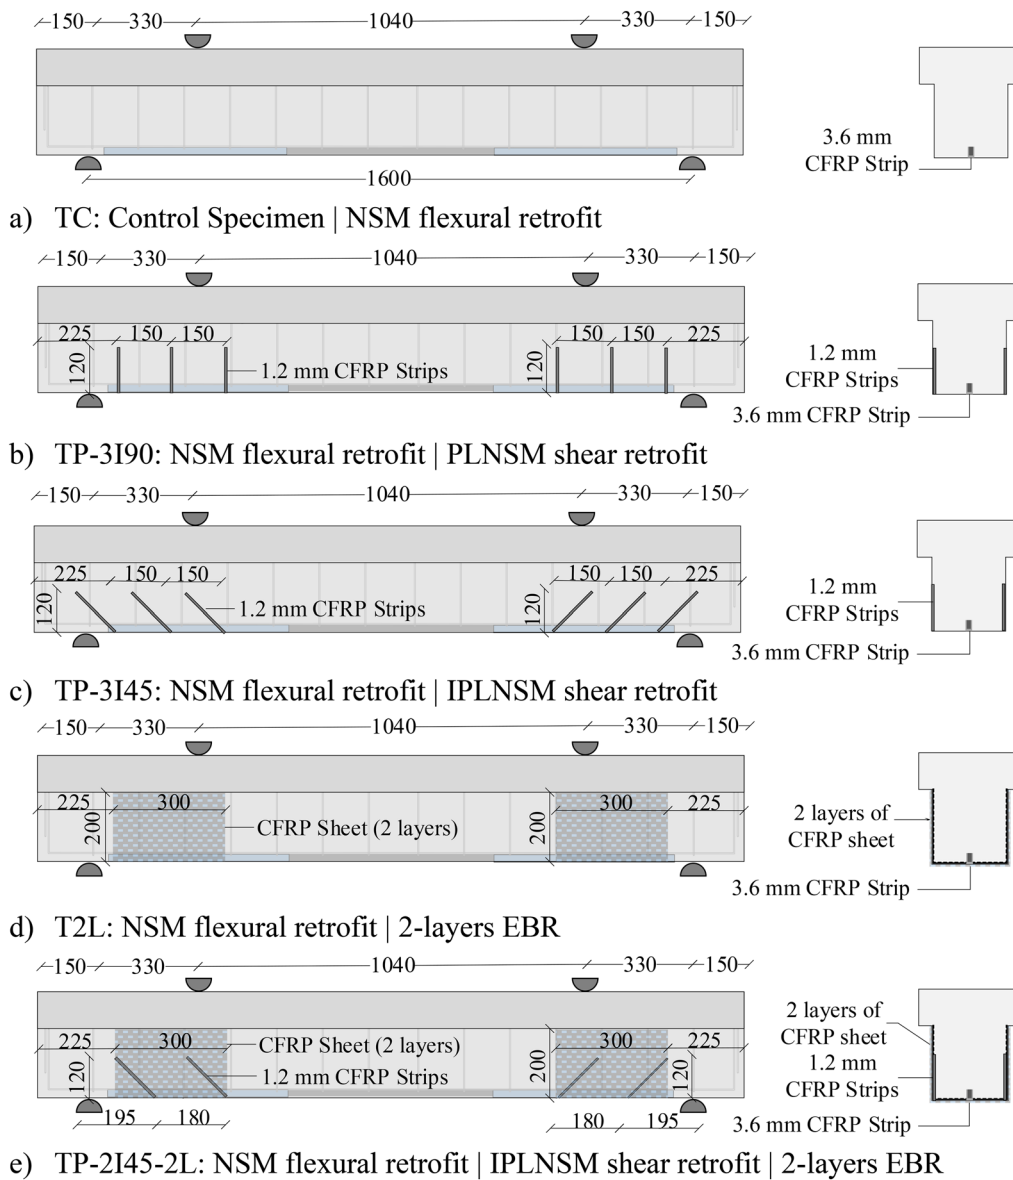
Details of the shear-strengthened specimens (unit: mm)
